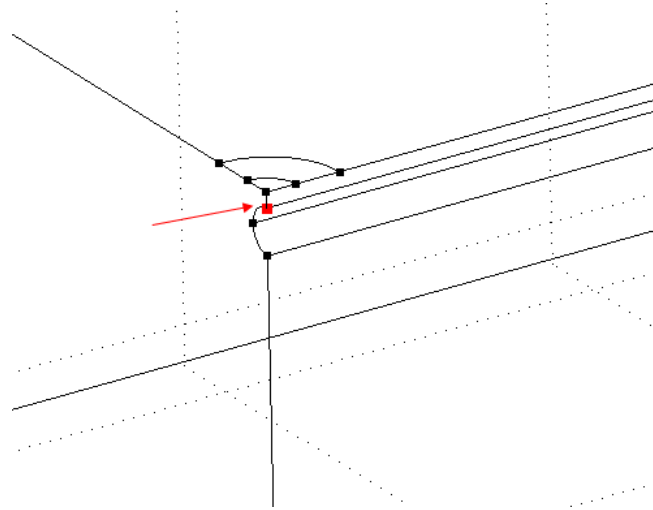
Indication (in red) of the “point of interest” on the steel rebar right under the measurement point on the surface of the concrete specimen.
